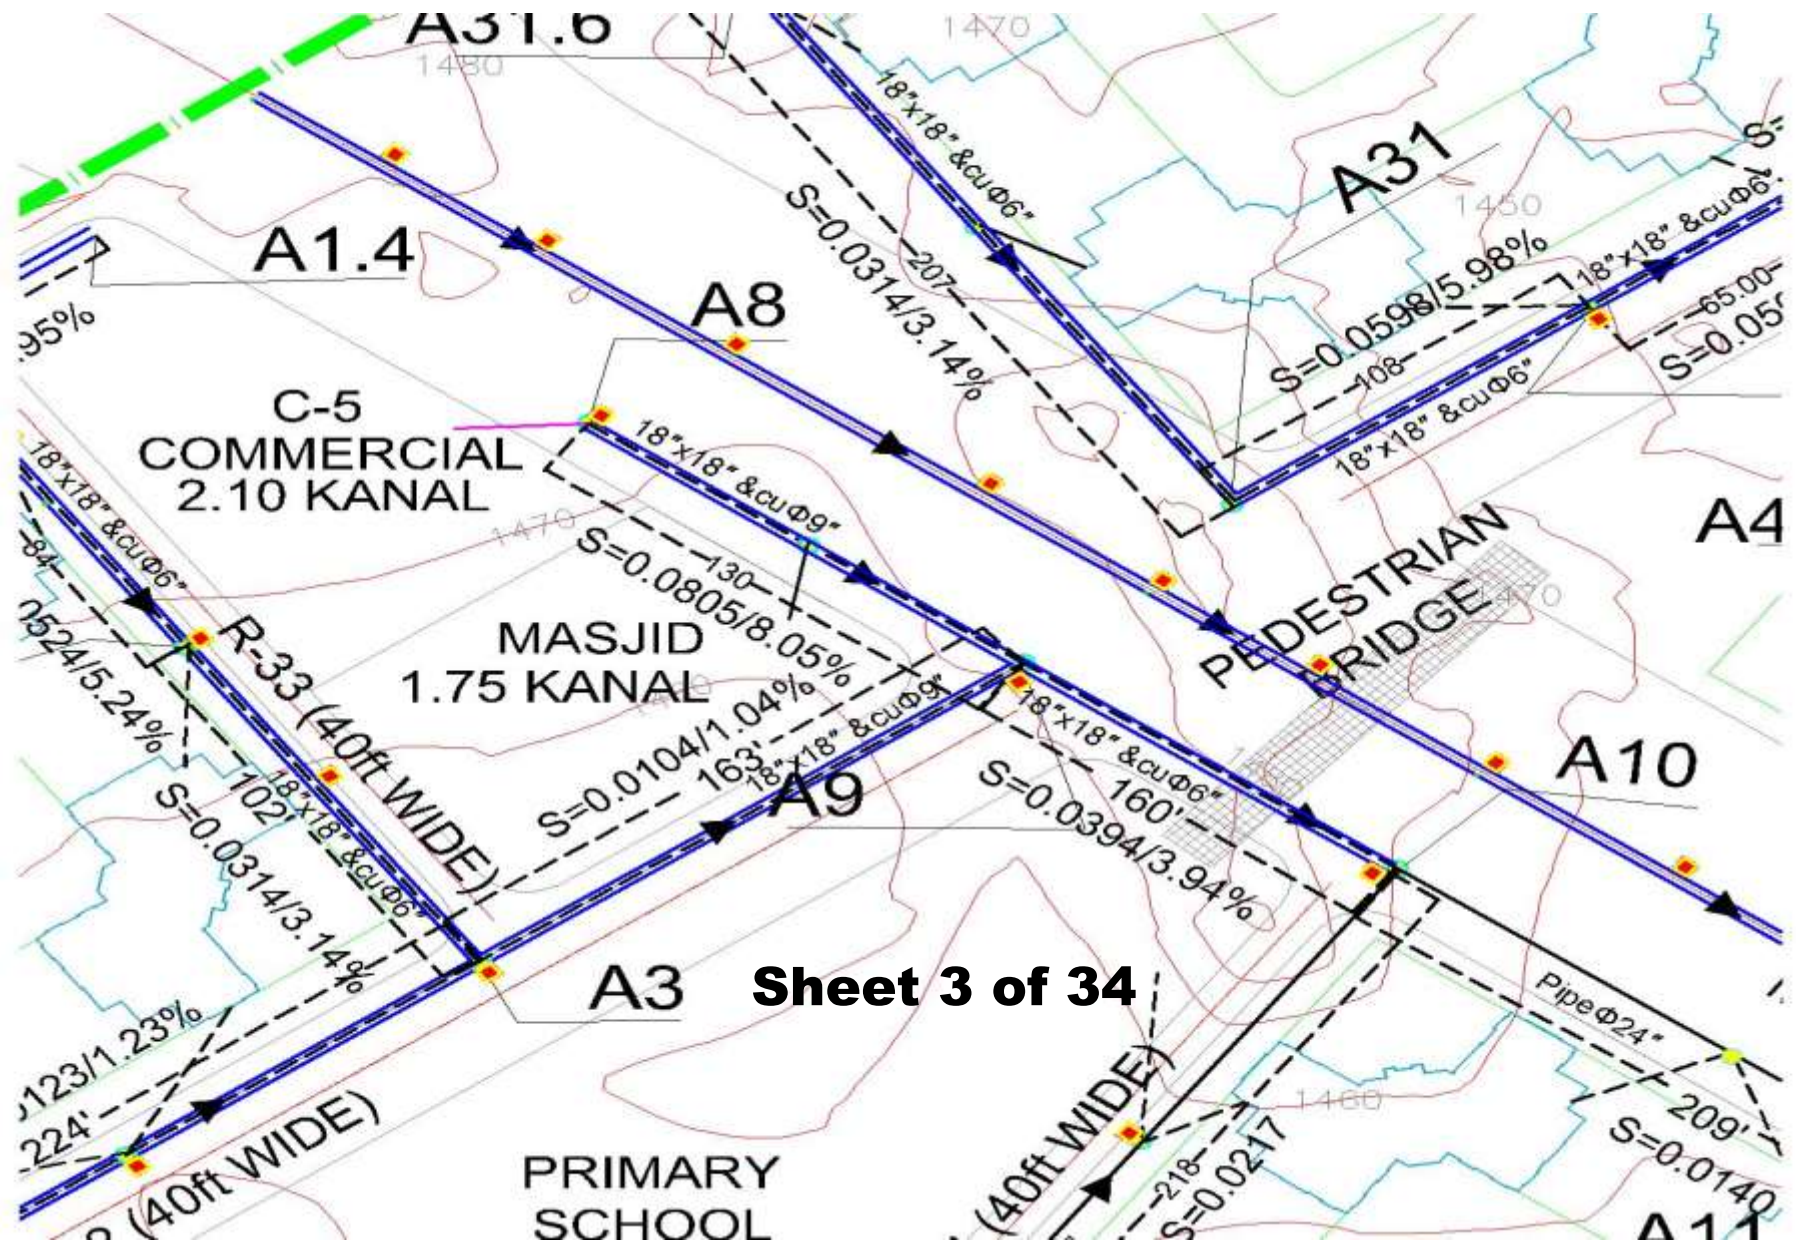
Combined drainage layout plan of Zone-1 at R/S of MR-01
